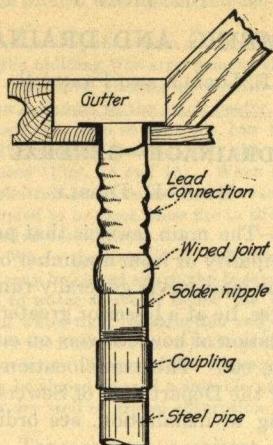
Storm down-pipe connection, steel pipe to roof gutter.
